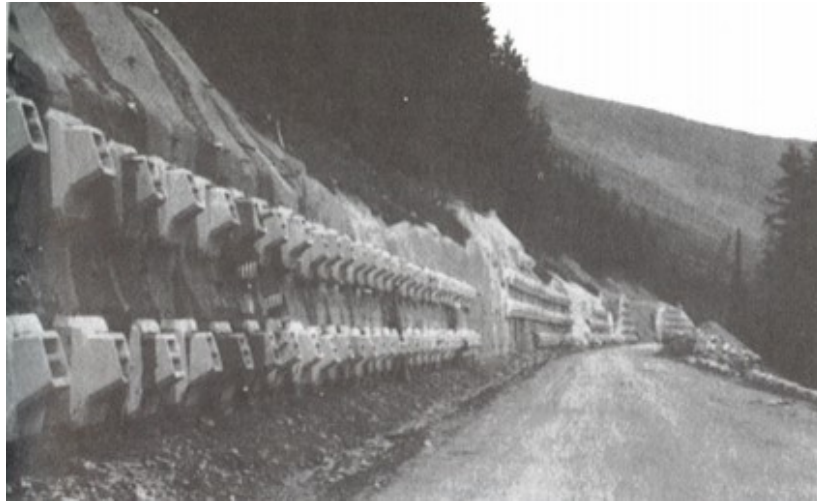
Retaining walls allow roads to be built on steep side slopes (from Abramson et al., 2002)
